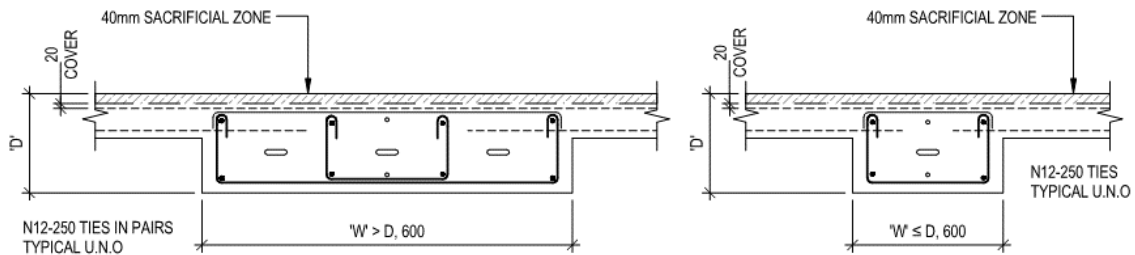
Typical internal beam detail with sacrificial topping.
